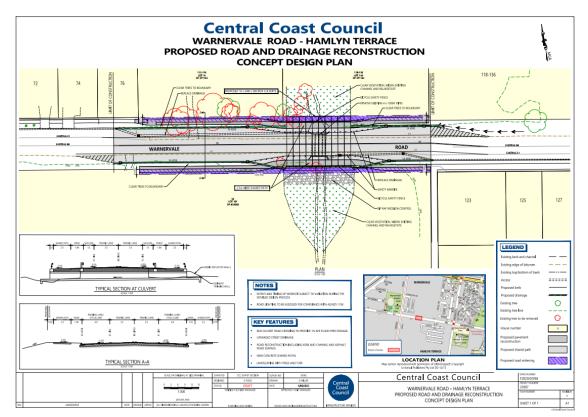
Proposed Road and Drainage Reconstruction Design Concept Plan – Warnervale Road
